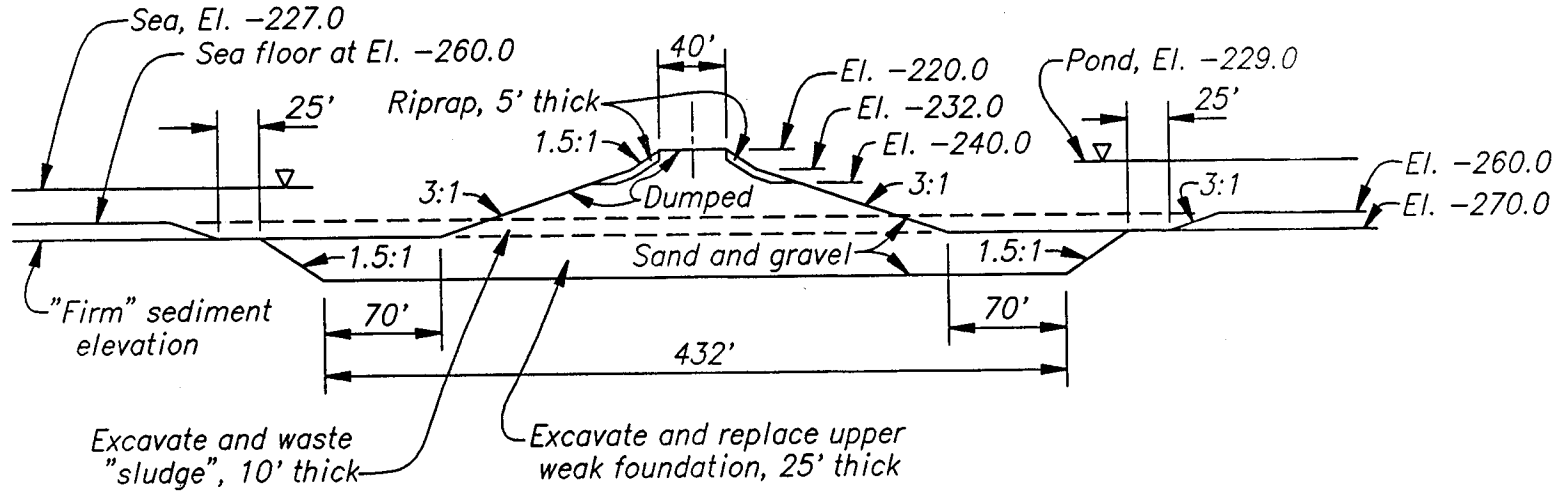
Cross sections show different foundation elevations in Sea bottom.
